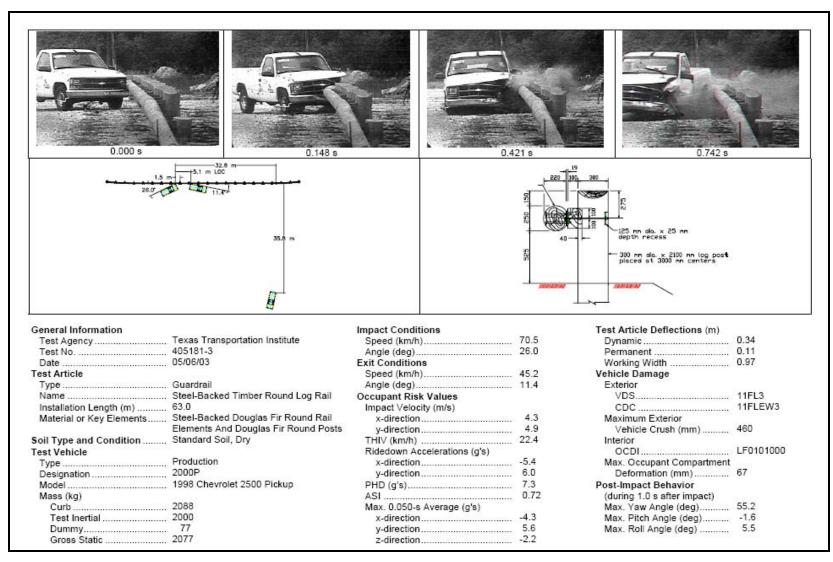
Steel-Backed Timber Round Log Rail Test 1
